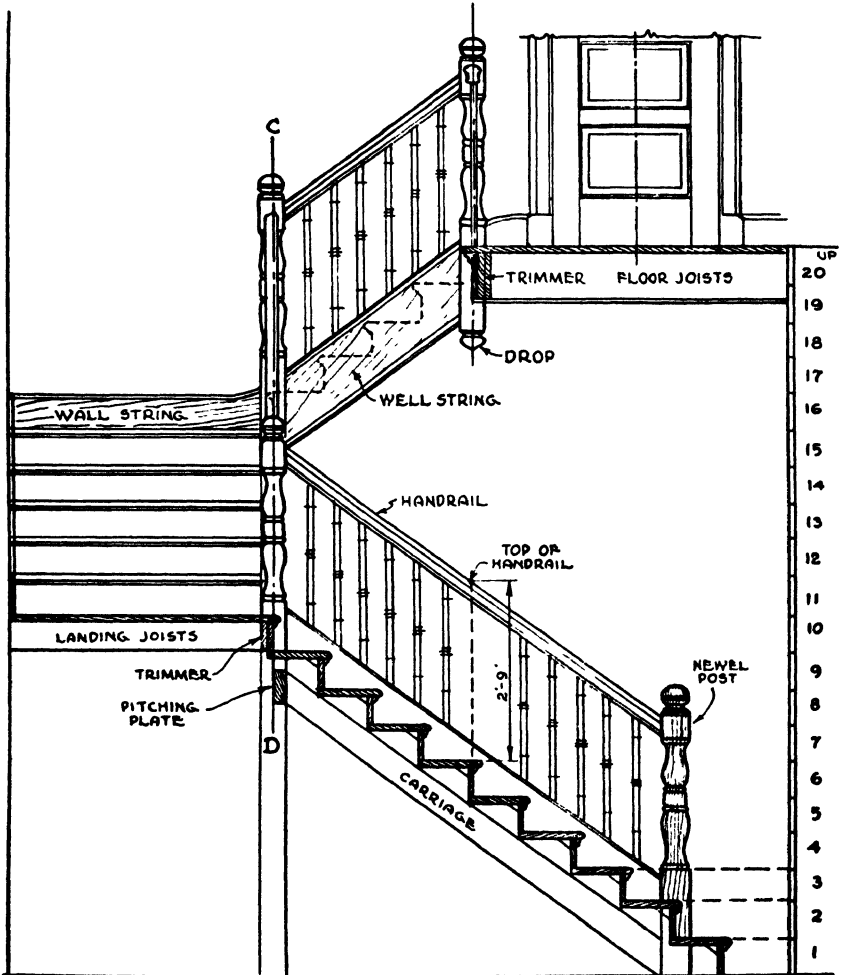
Section of Stair, Plan of Which Is Shown in Fig. 64
